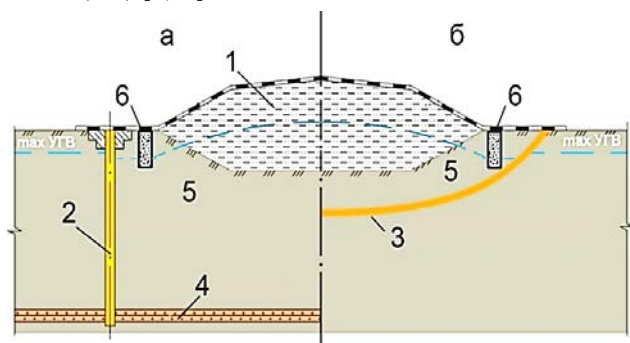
Scheme of protection of soil and groundwater against contamination: a – at presence of waterproof layer; b – at absence of waterproof layer; 1 – storage; 2 – GWC; 3 – HIS – artificial waterproof layer; 4 natural waterproof layer; 5 – contaminated soil; 6 – drainage
